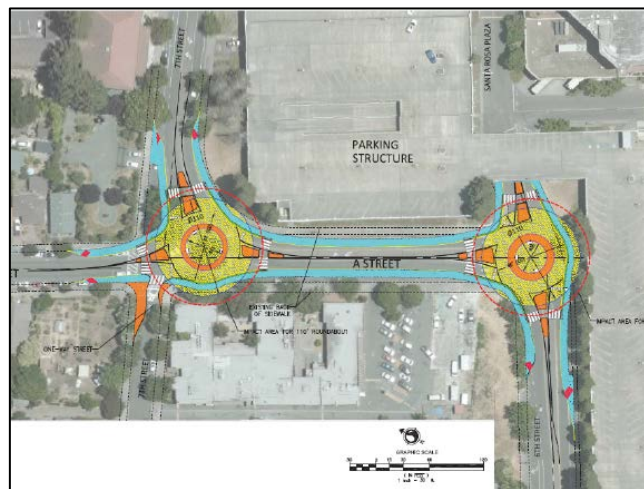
A Street 80-foot Roundabout Concepts with One-Way Street on 7th Street.
